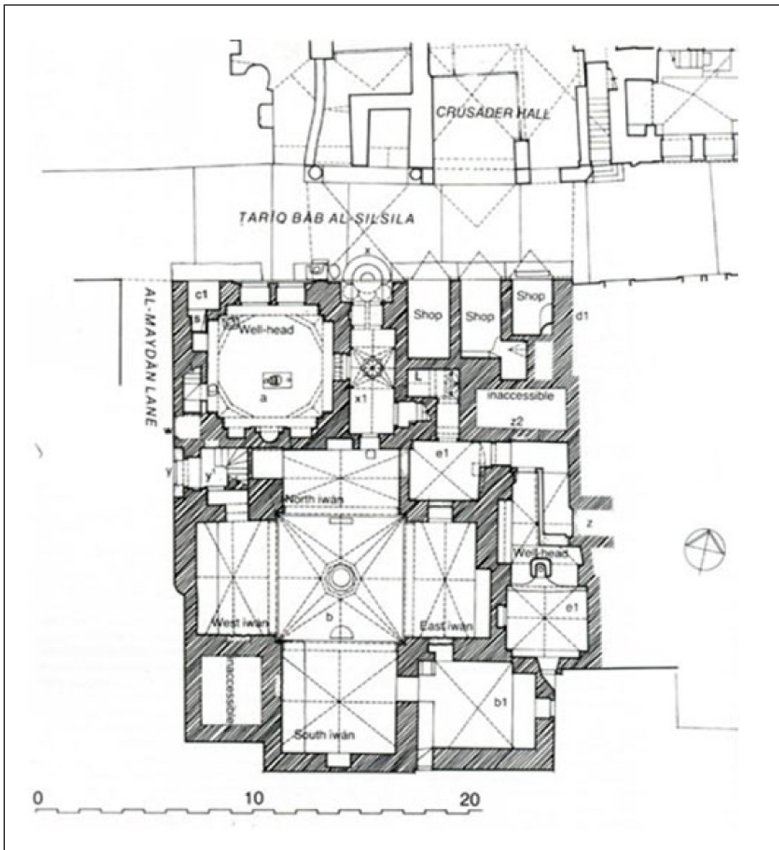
Ground floor plan of the madrasa al-Tashtamuriyya.
